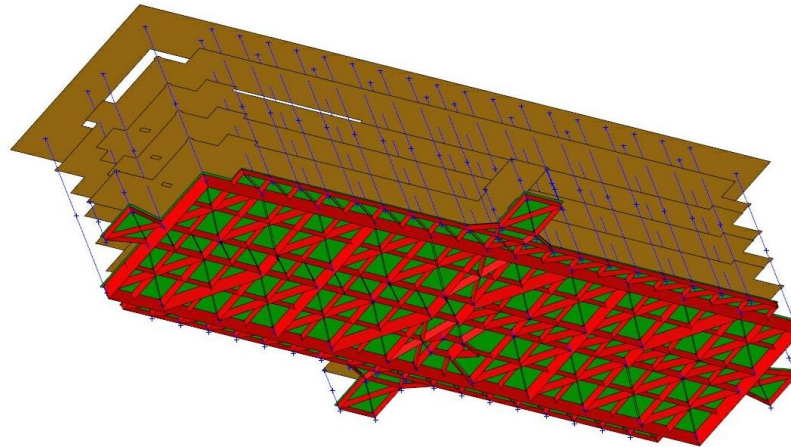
3D view of building showing the upper structure and the SNSF foundation system (in red)
